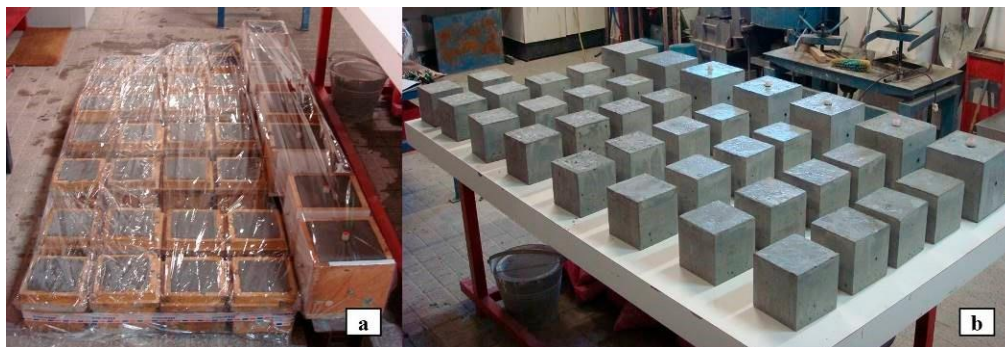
Concrete test specimens: (a) protection, (b) demolding.
